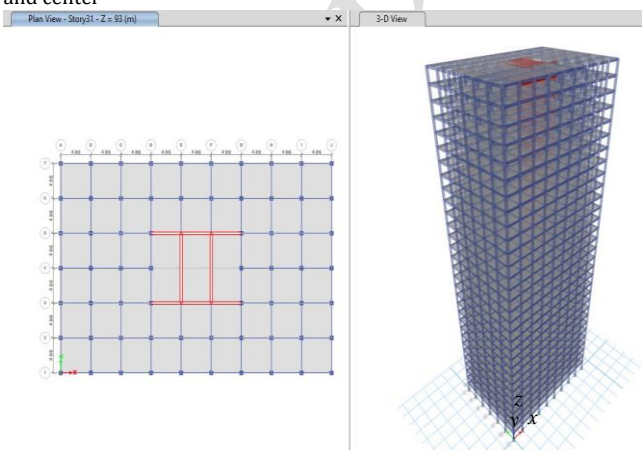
Model 9-Building with shear wall located at the center in I-shape
